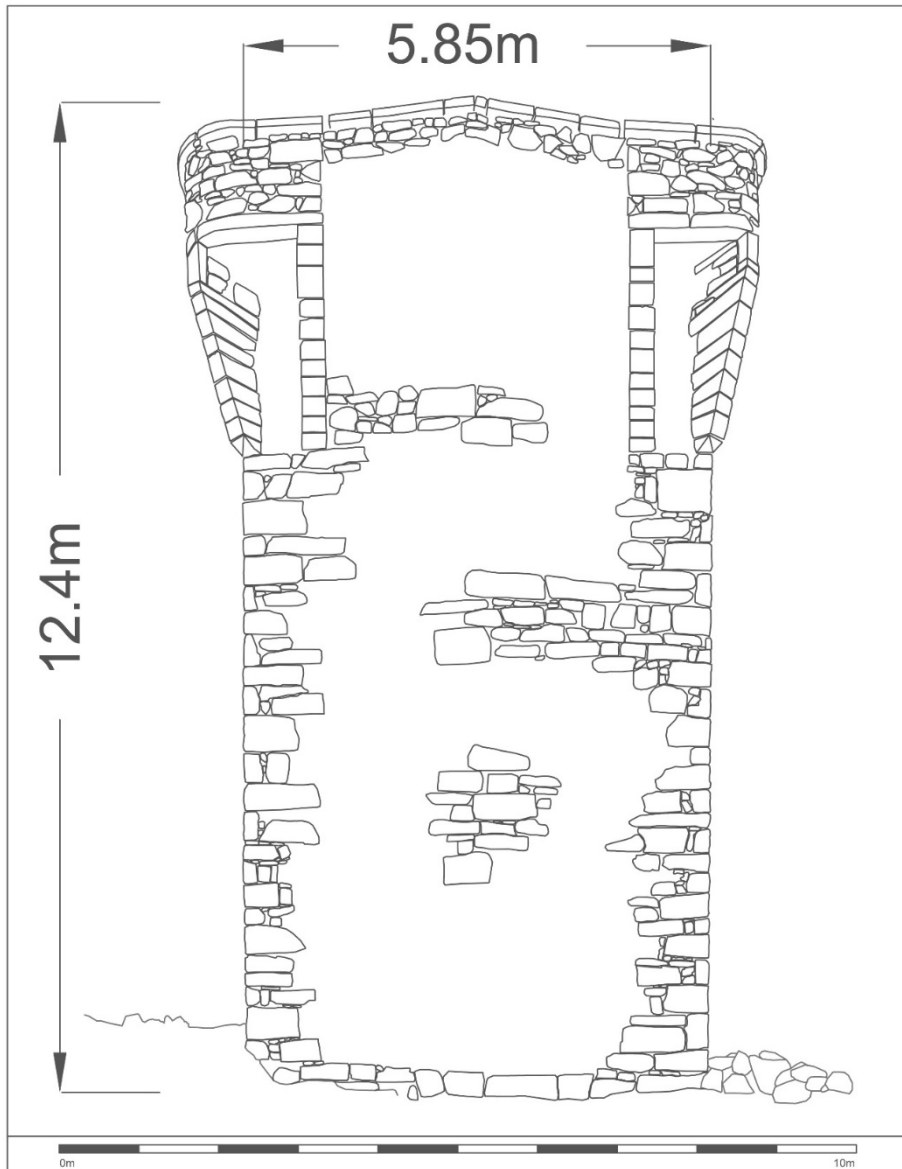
External elevation of the north-east wall of the signal tower at Lettermullan Island Signal Station.
